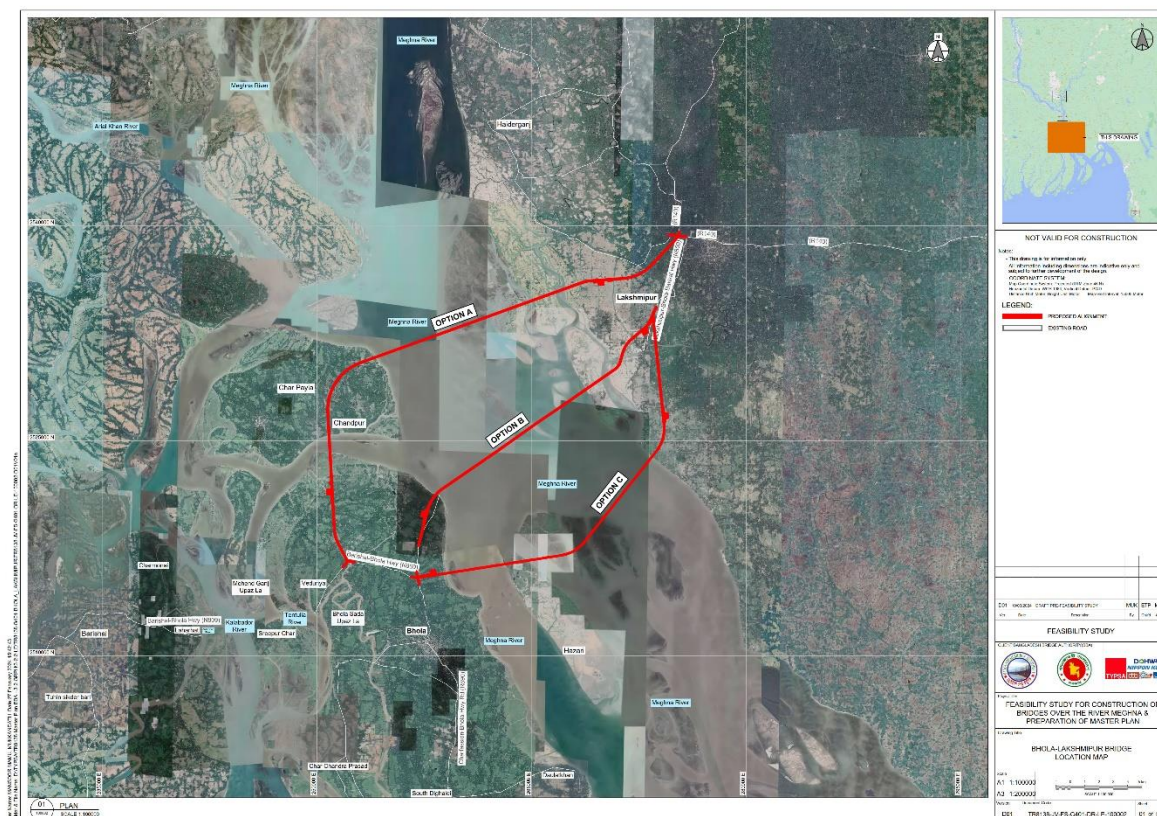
Bhola-Lakshmipur Bridge alignment options layout
